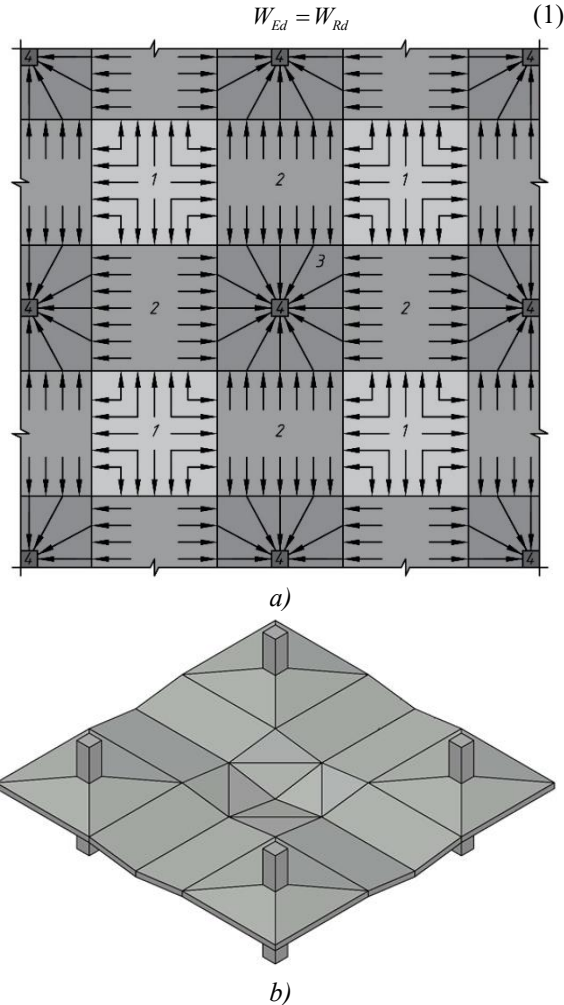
Load distribution between slabs of a precast flat plate floor (a) and yield line model of floor deformation in the limit state (b): 1 – middle slab; 2 – inter-column slab; 3 – over-columned slab; 4 – column
